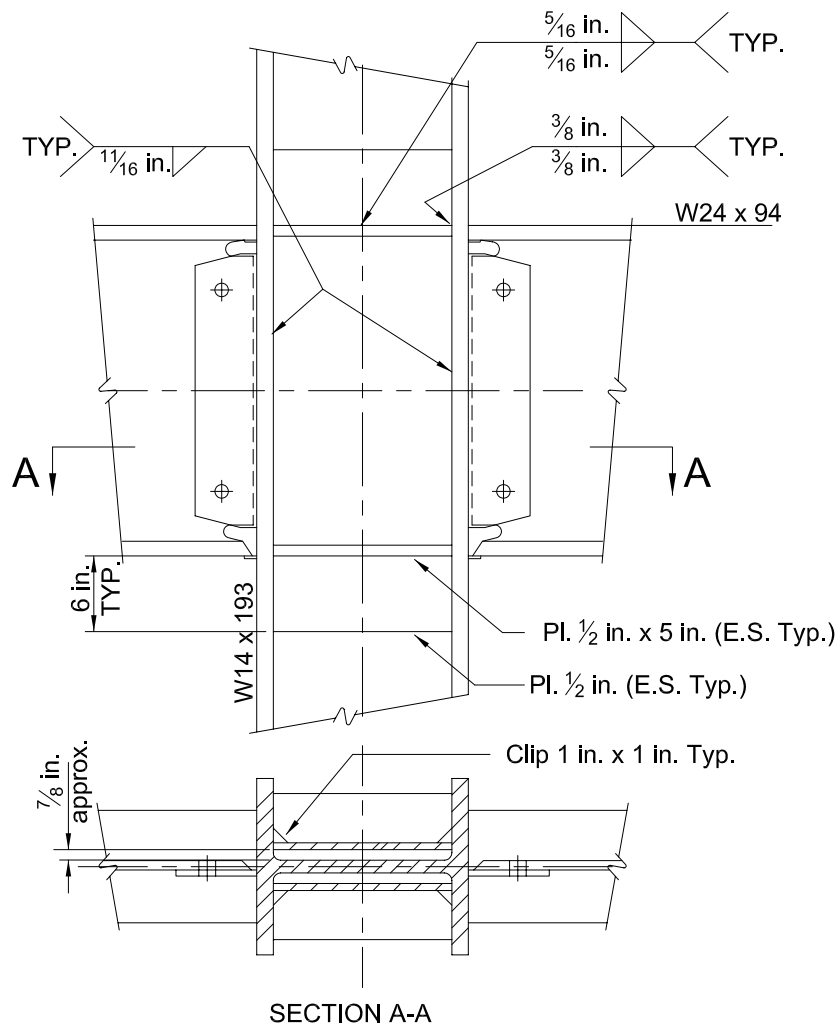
Example of fillet welded doubler plate and stiffener details.
